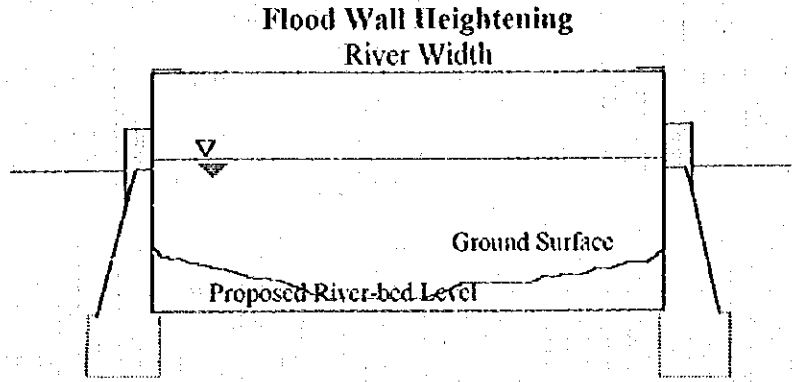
Typical Cross Section of Floodwall Heightening
